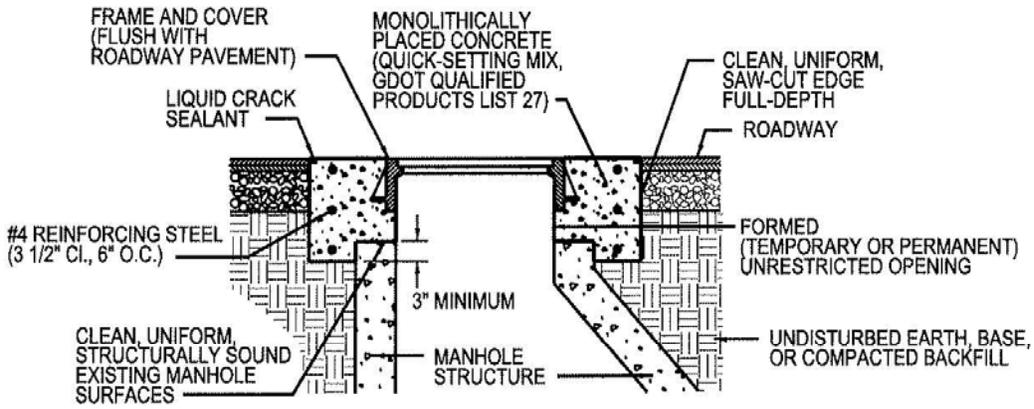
COBB COUNTY WATER SYSTEM MANHOLE ADJUSTMENT IN PAVEMENT
